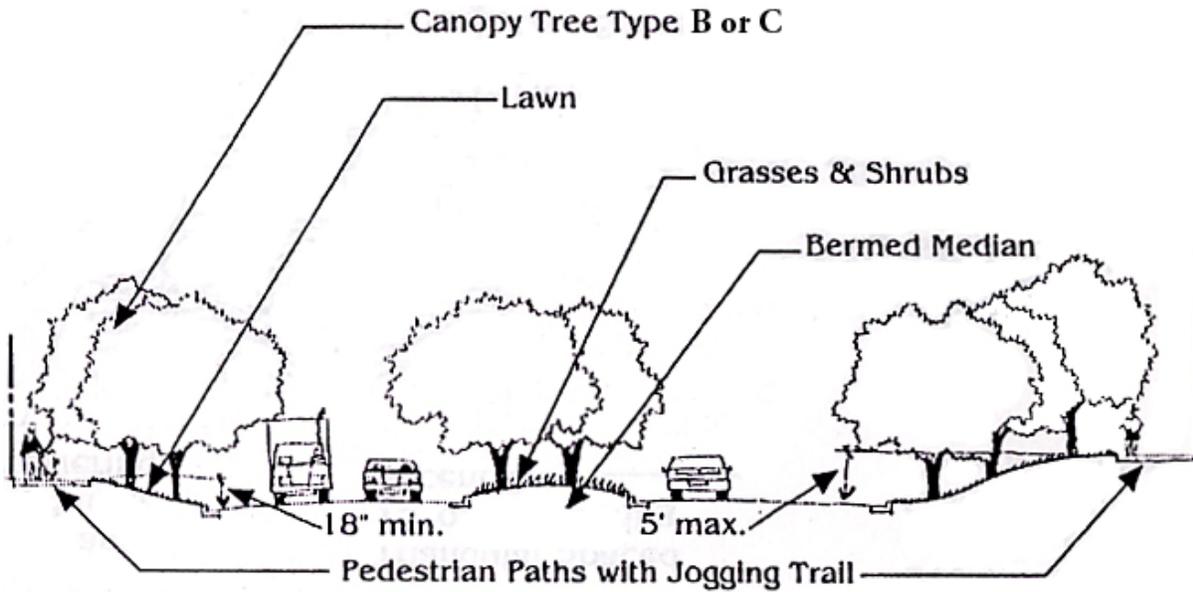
CENTRAL PARKWAY LANDSCAPE CROSS SECTION G-G
